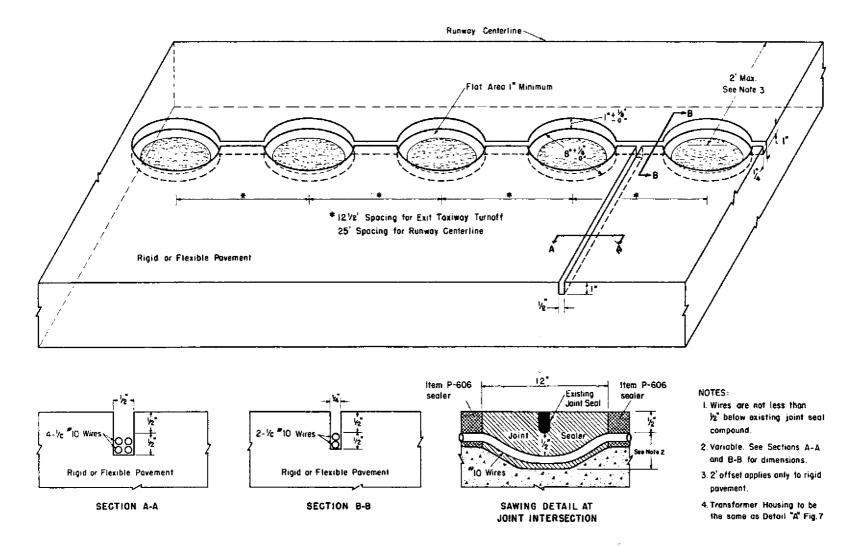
PAVEMENT SAWING AND DRILLING DETAILS FOR RUNWAY CENTERLINE AND TAXIWAY TURNOFF LIGHTING
